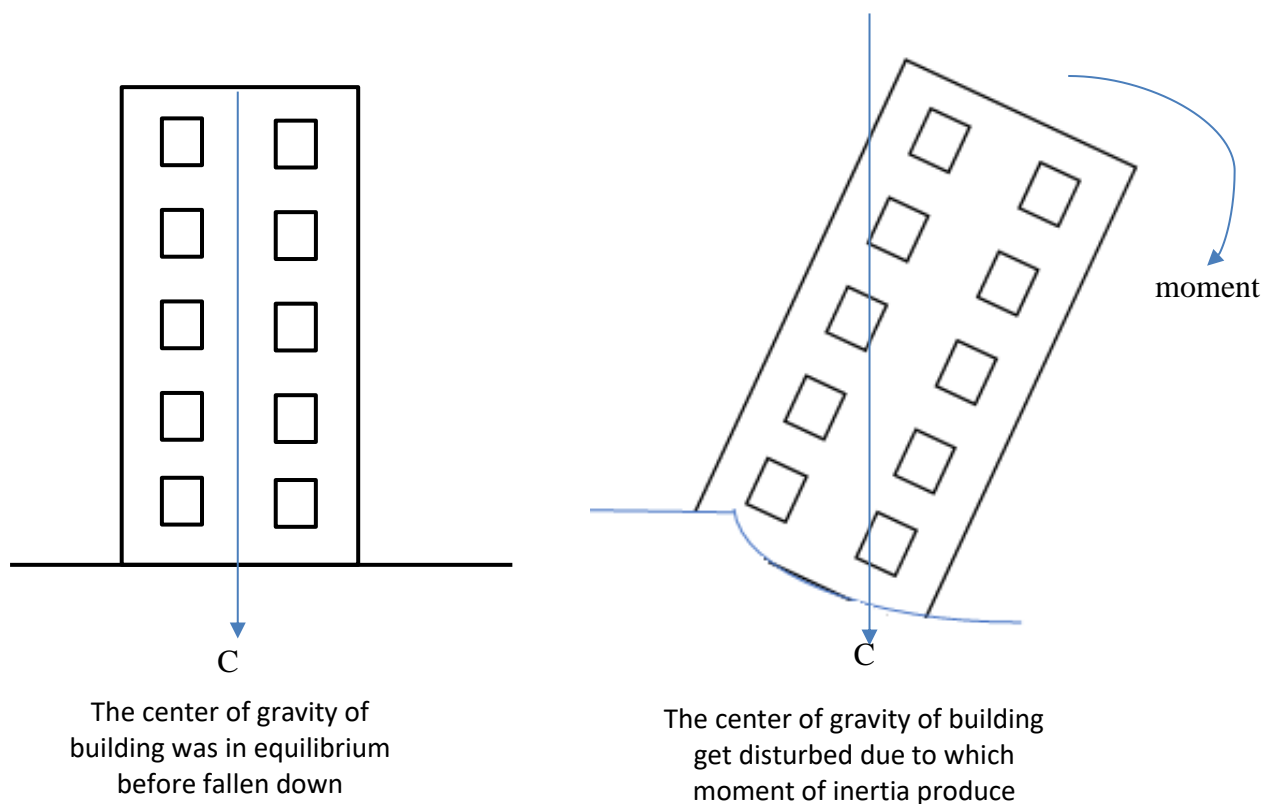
rough diagram to demonstrate how the disturbed center of gravity affect the stability of building (collapse the building).
